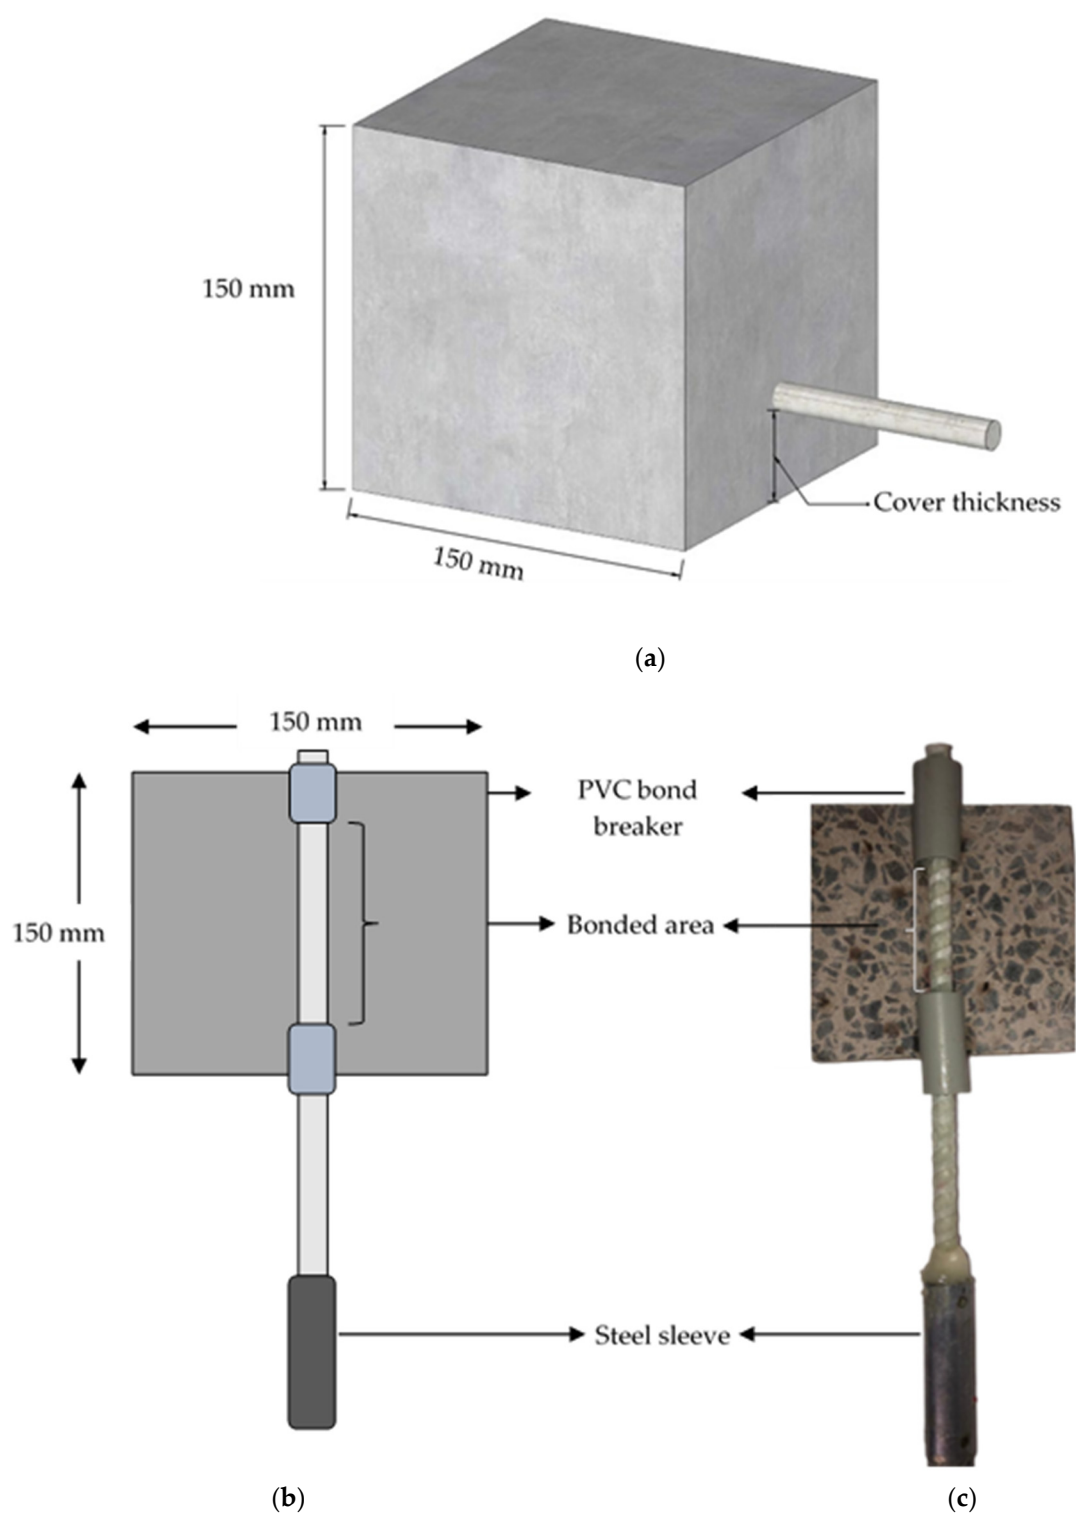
Details of pull-out test configuration: (a) overview of the bar and concrete block; (b) schematic section view of the pull-out test specimen; (c) section view of a pull-out test specimen.
